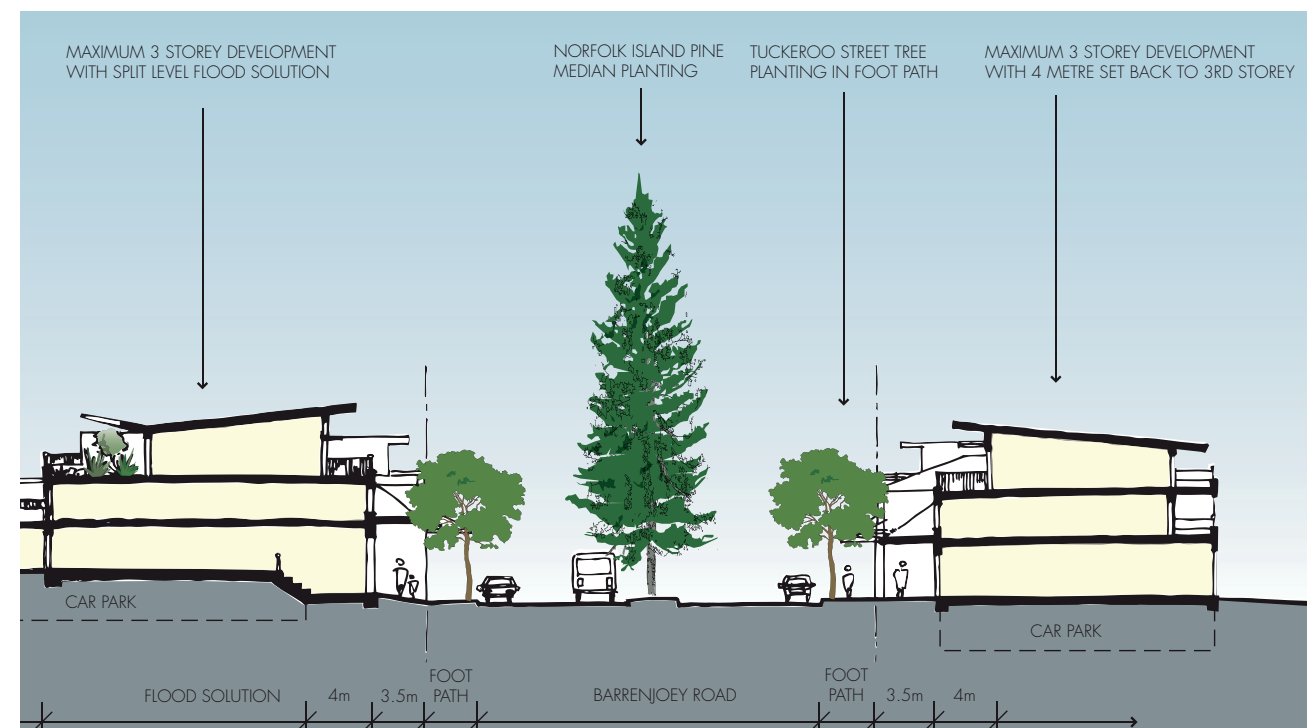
Section through Barrenjoey Road between Seaview Avenue and Robertson Road
